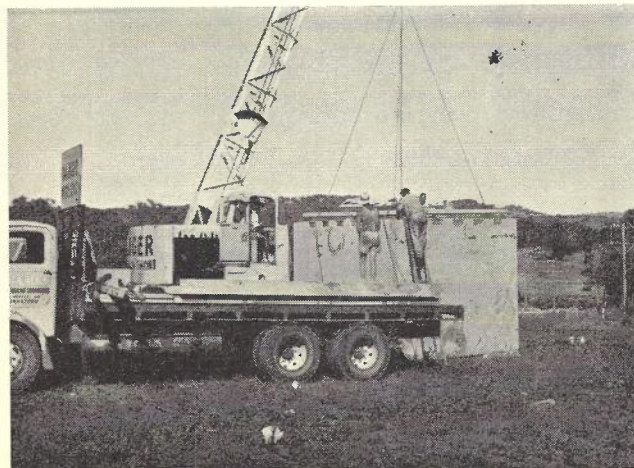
Placing Ceiling Section Into Position (Connors Creek).
